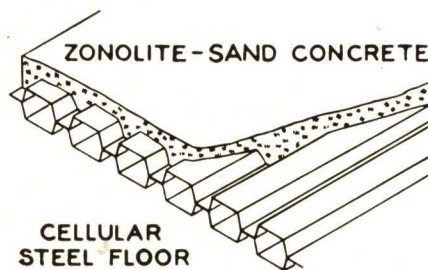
Zonolite-Sand Concrete Fill over structural floors.
